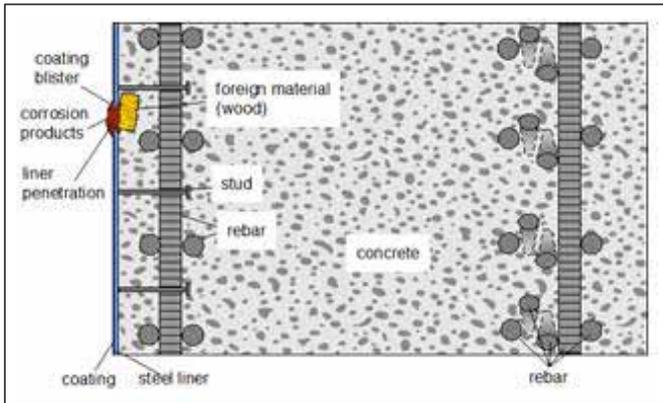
Schematic showing a cross-section of a reinforced concrete containment structure with embedded foreign material from original construction and corrosion penetration of the steel containment liner
